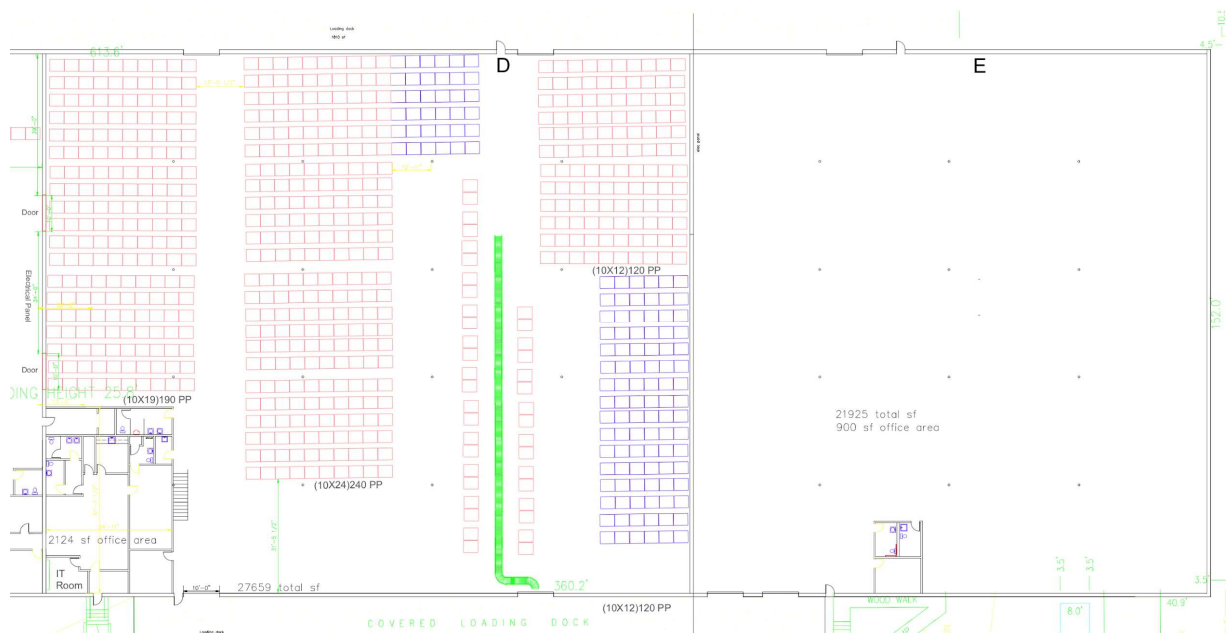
Layout of the Bed Bath & Beyond and FootLocker Warehouses
